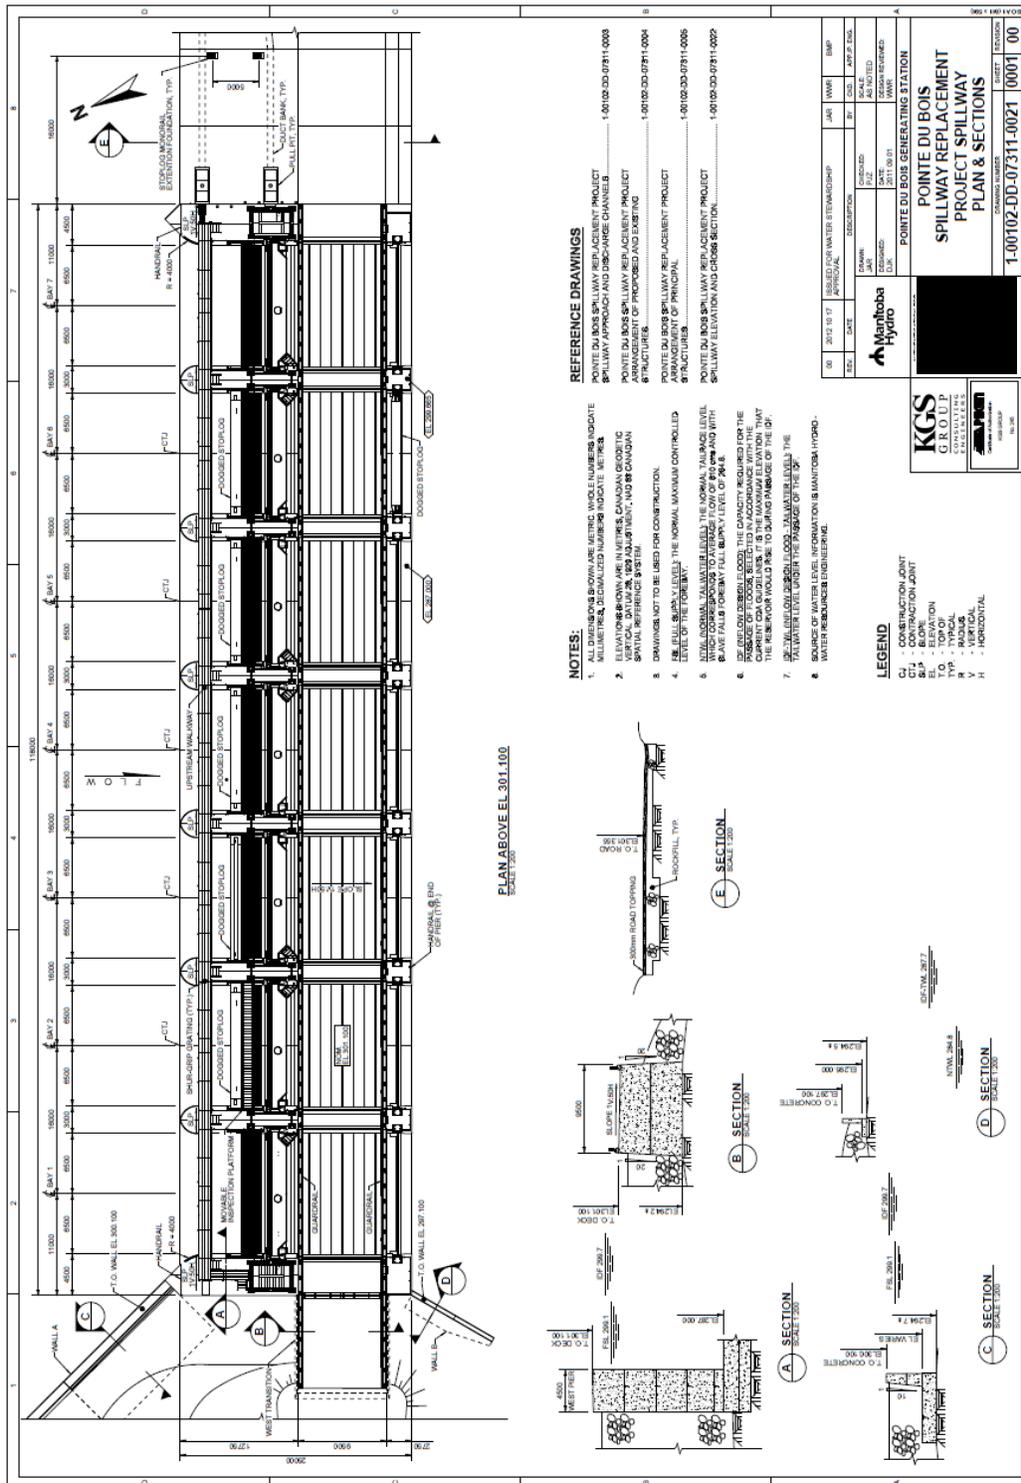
Spillway Replacement Project - Spillway Elevation & Cross Section
